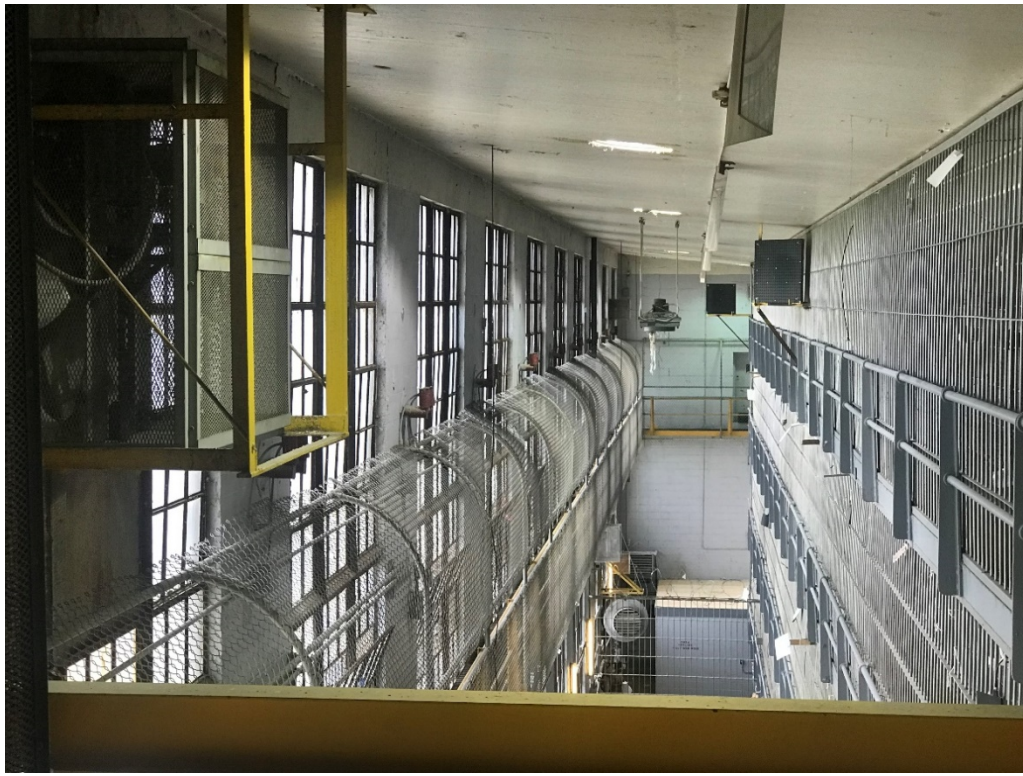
& 2 – View of Catwalk Level Enclosure & Gallery from Ground Floor
